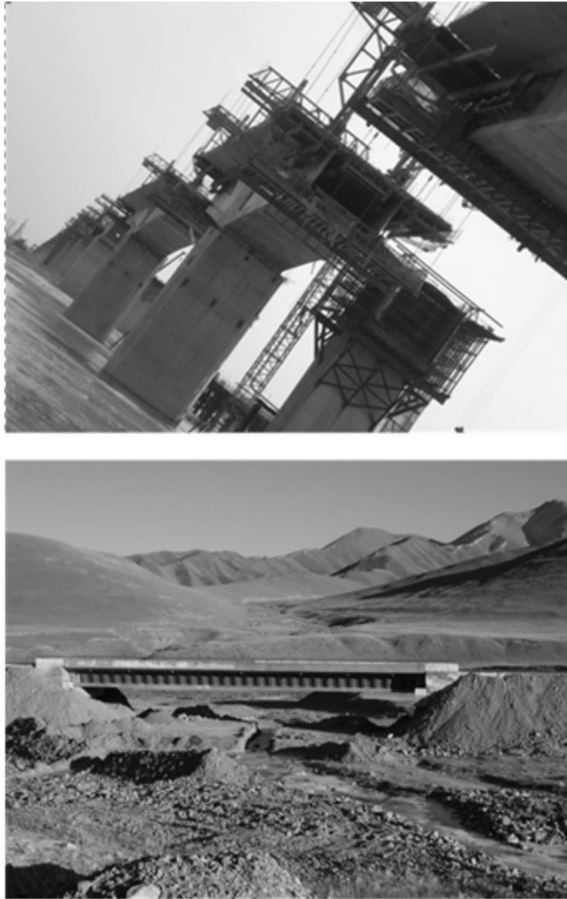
Two snaps of a bridge constructed with simply supported PC beams with corrugated steel webs
